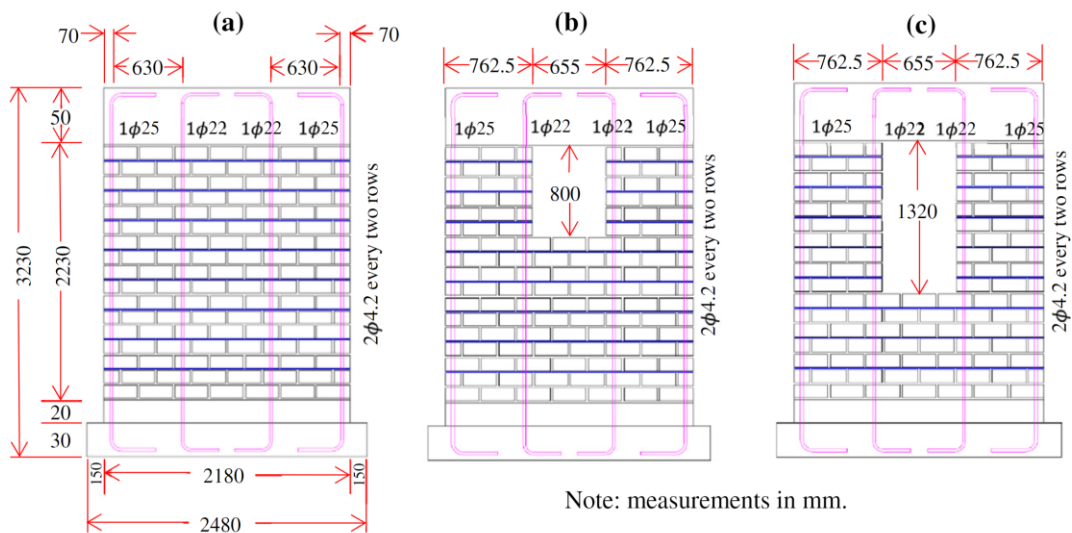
Clay Brick Test Specimens (a) S1 (b) O1 (c) O2 (Calderón et al., 2017)
